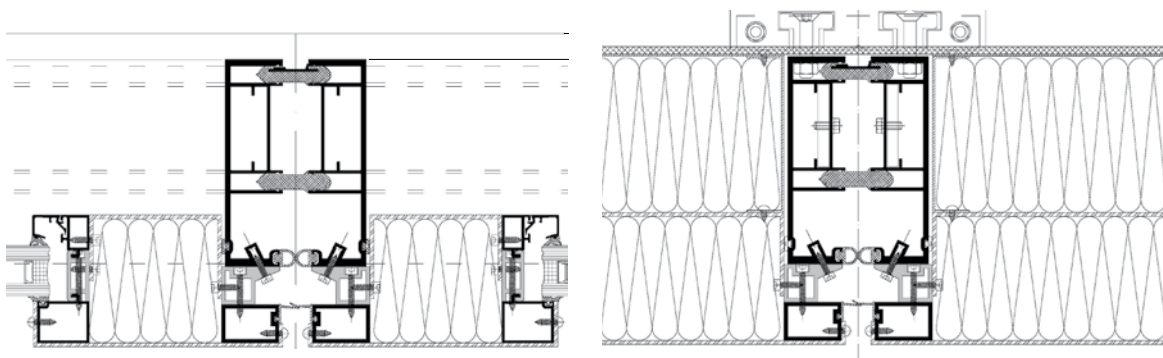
Type 1 horizontal detail spandrel area and vision area n.t.s. (source: own image)
